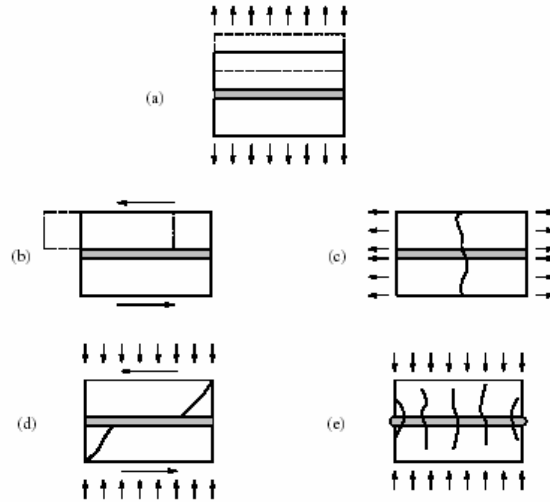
Masonry failure mechanisms: (a) joint tensile cracking; (b) joint slipping; (c) unit direct tensile cracking; (d) unit diagonal tensile cracking; (e) masonry crushing (Lourenco 1996, p.44).
